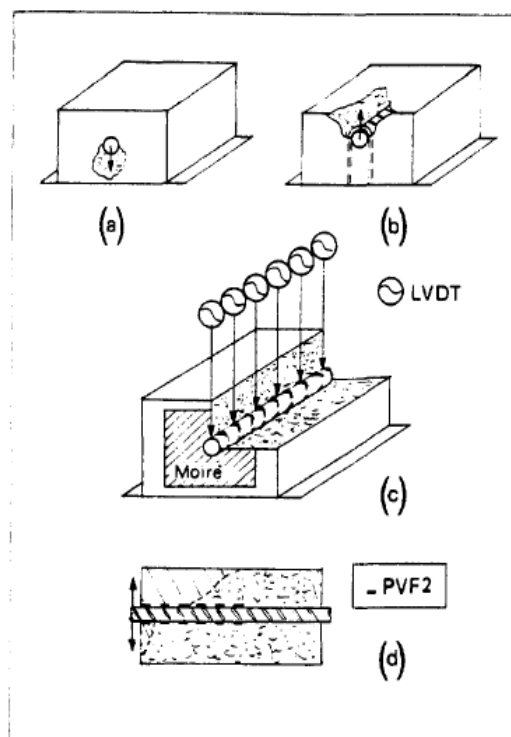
PVDF Sensor Arrangement In The Concrete Specimen
